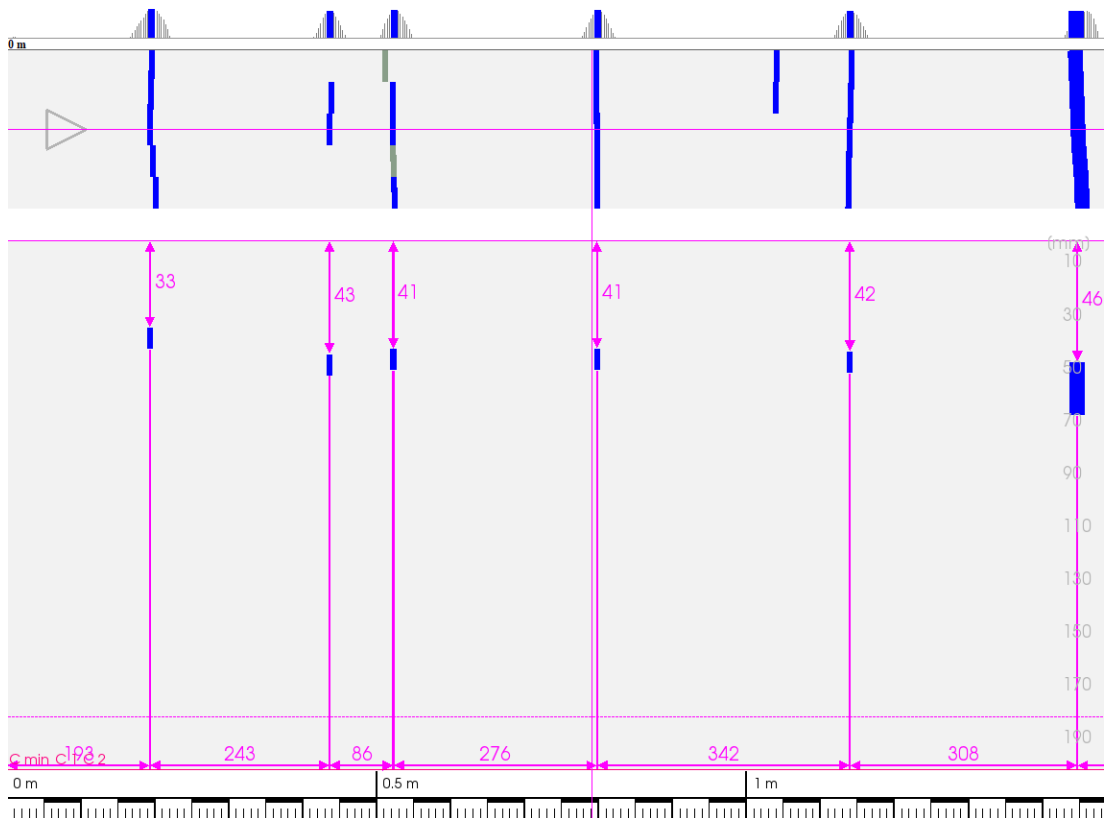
Ferro scan of concrete cross wall showing reinforcement spacing and cover.
